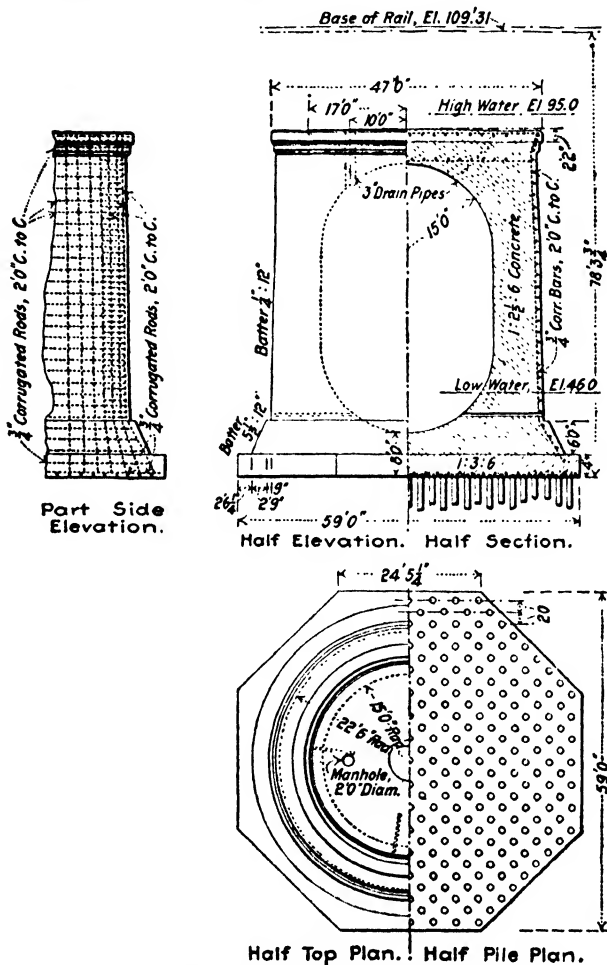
Reinforced-concrete Pivot Pier, Illinois Central Railroad Bridge, Gilbertsville, Ky.
